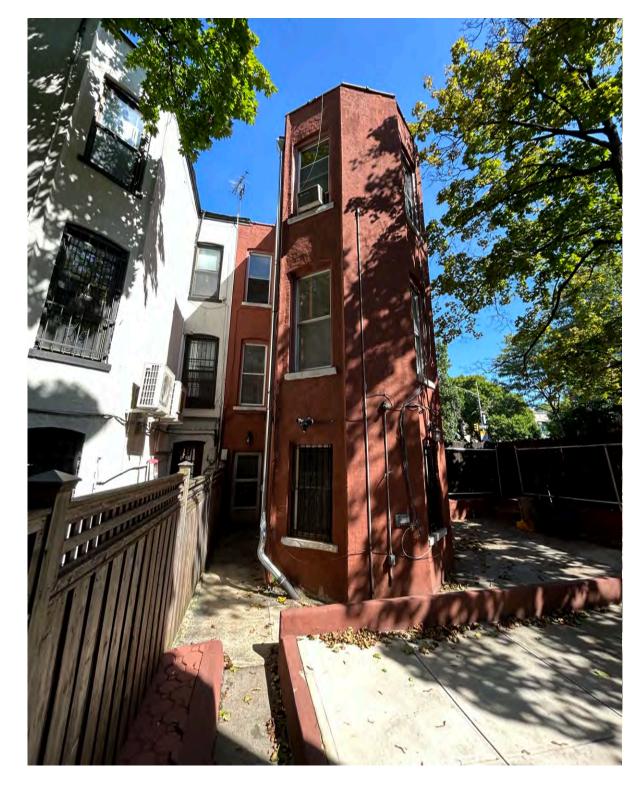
PHOTO OF REAR YARD ELEVATION - EXISTING CONDITIONS
